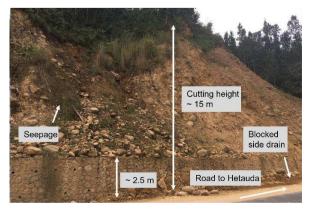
Example of an ineffective mortared masonry wall on the Madan Bhandari Road.
